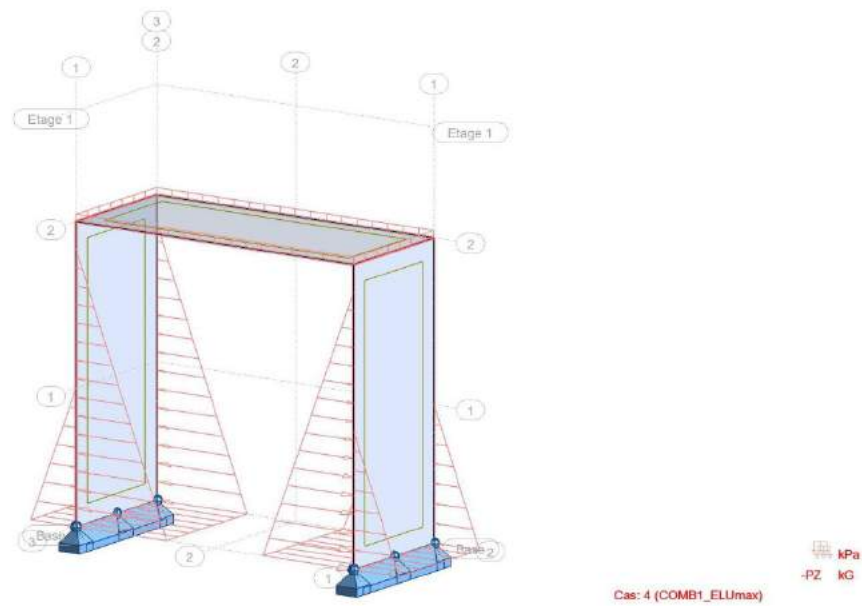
Foobridges – Model for the reinforced concrete ramps (with earth pressure loads)
